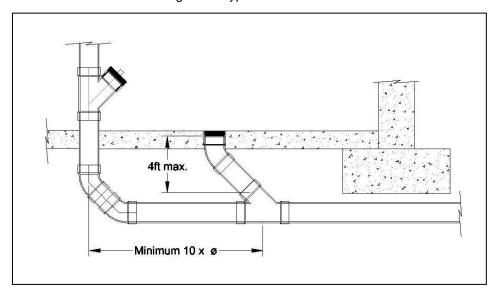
Typical installation –Cables used to extract the bladder limit the installation depth to 4ft. To limit presence of detergent suds we recommend sensors to be 10x pipe diameter away from plumbing stack.
